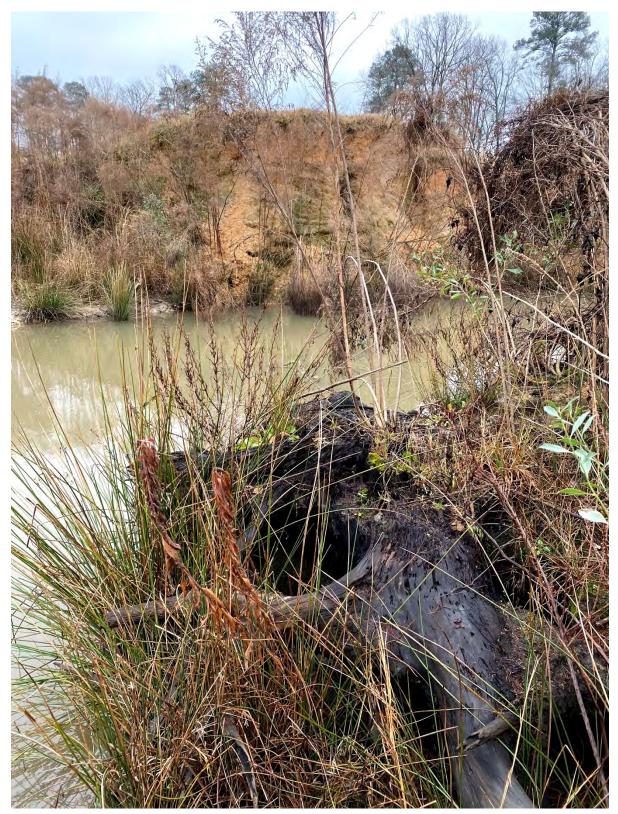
UT-2 Failed Crossing – Historic floodplain elevation with historic tree roots visible at break between historic floodplain and fill material
